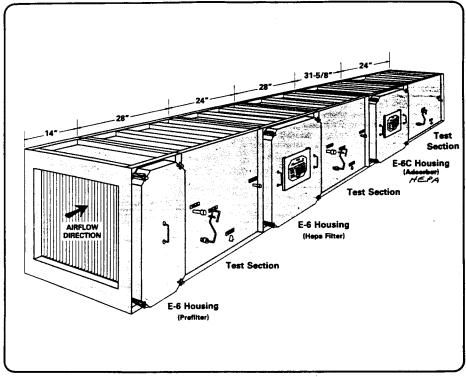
E-6 Filter Housings with In-Place Test Sections DC MNL 13
